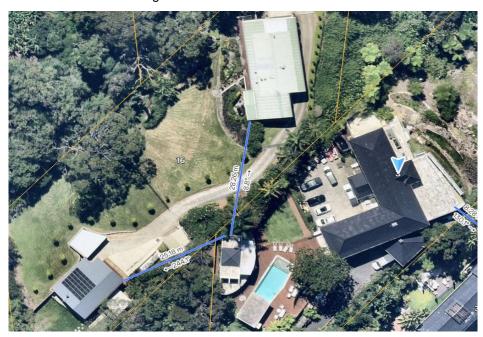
Relationship between the existing pool house structure and 16 Illya Avenue (Source: Gyde)
